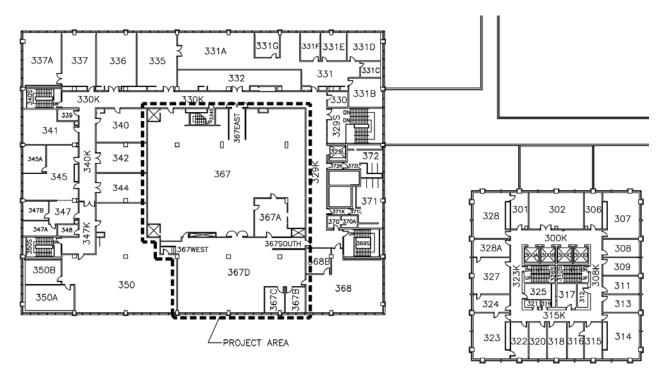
McLennan Physics Building, Existing Third Floor Plan
